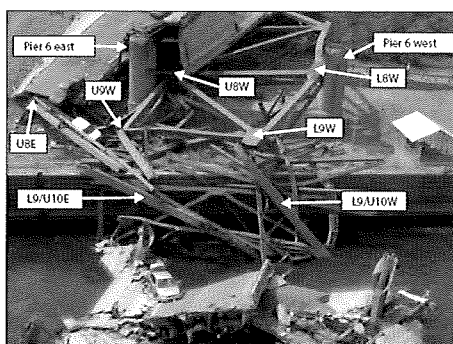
Bridge on I-35W at Minneapolis, USA. Overview of bridge after collapse
